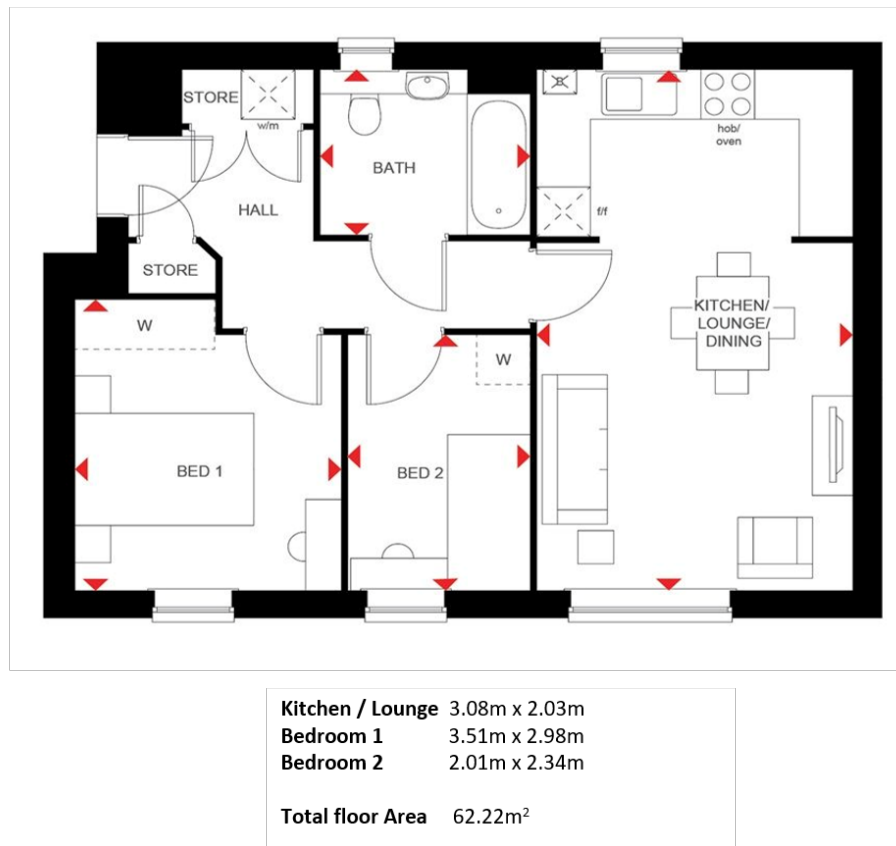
Model of residential building used for this study. The building include 2 flats per floor: flat 1 - Ambersham, flat 2 - Maldon [26]. Foundations and floor plan on Figure 9. The building was adjusted to different heights: $4 \leq \text{LRF} \leq 6$, $7 \leq \text{HRF} \leq 10$, $\text{HRF} > 10$ by using provisions included in Tables 4, 5 and 6.
